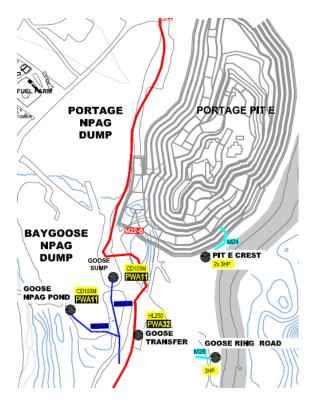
View of Portage Pit E area with the associated sumps and trenches
